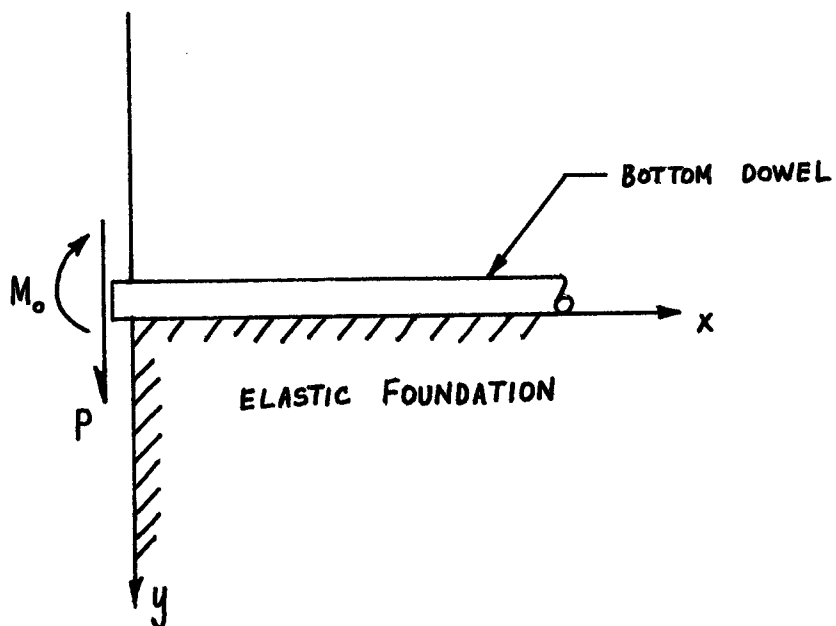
Bottom Dowel Specimen as a Beam-on-elastic Foundation
